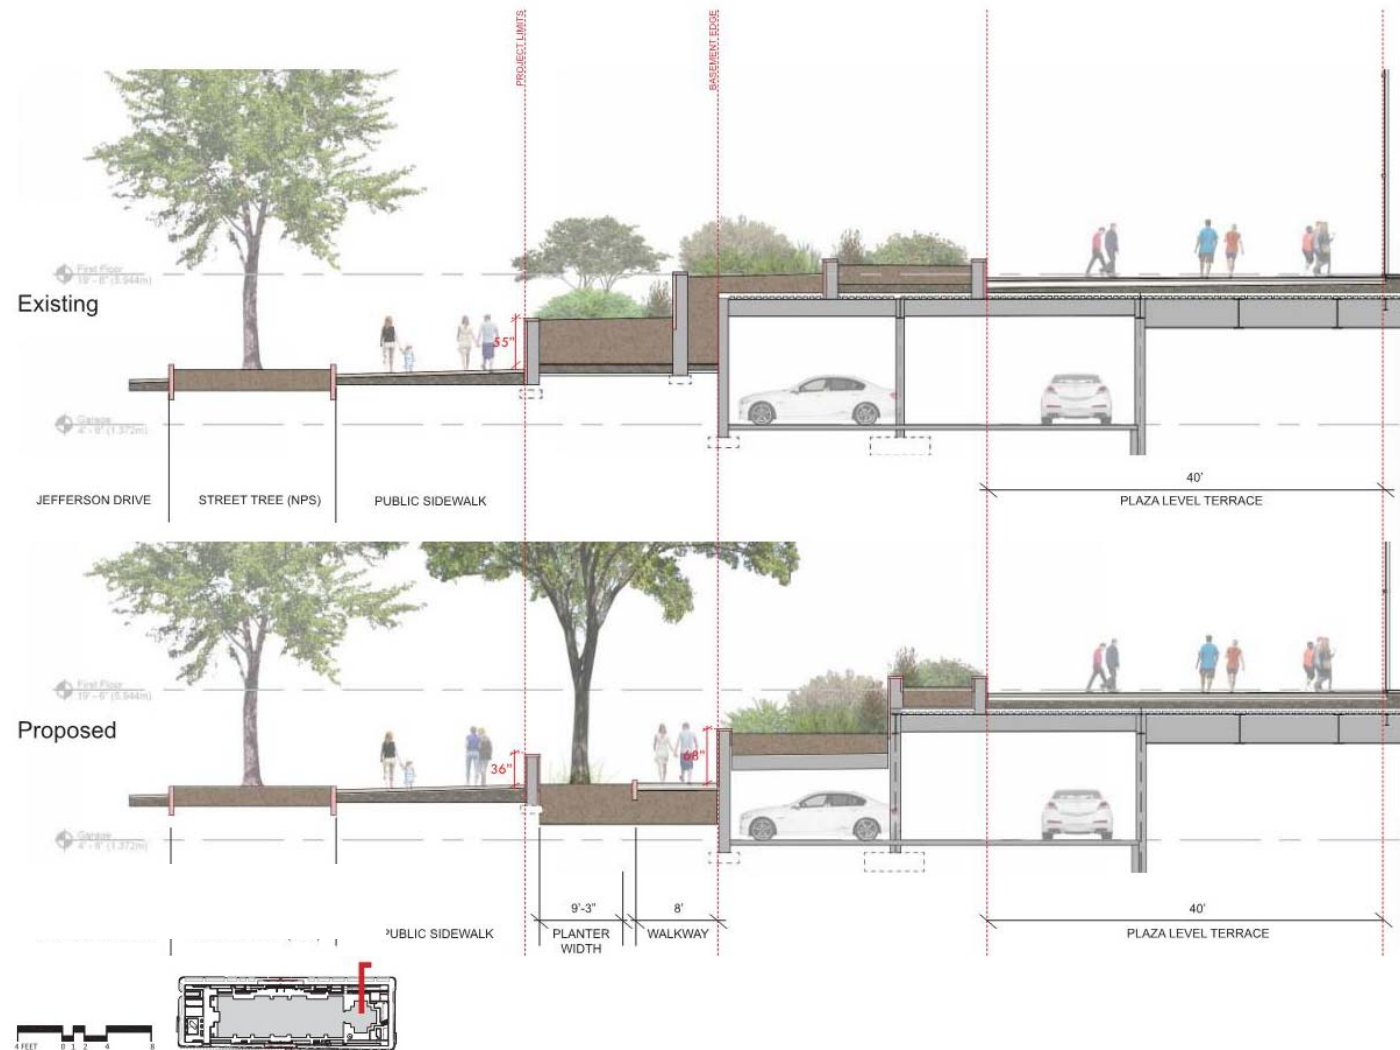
Northeast Section, Existing and Proposed Condition. (Source: AECOM.)
